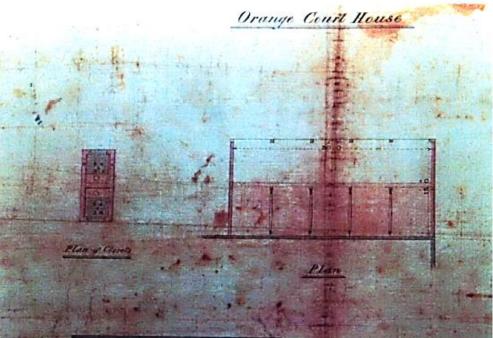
Orange Courthouse Barnet designs 1881-1883 – detail of Closets and Stables in plan. Source: AONSW Plan 834 in Mider, 1998
